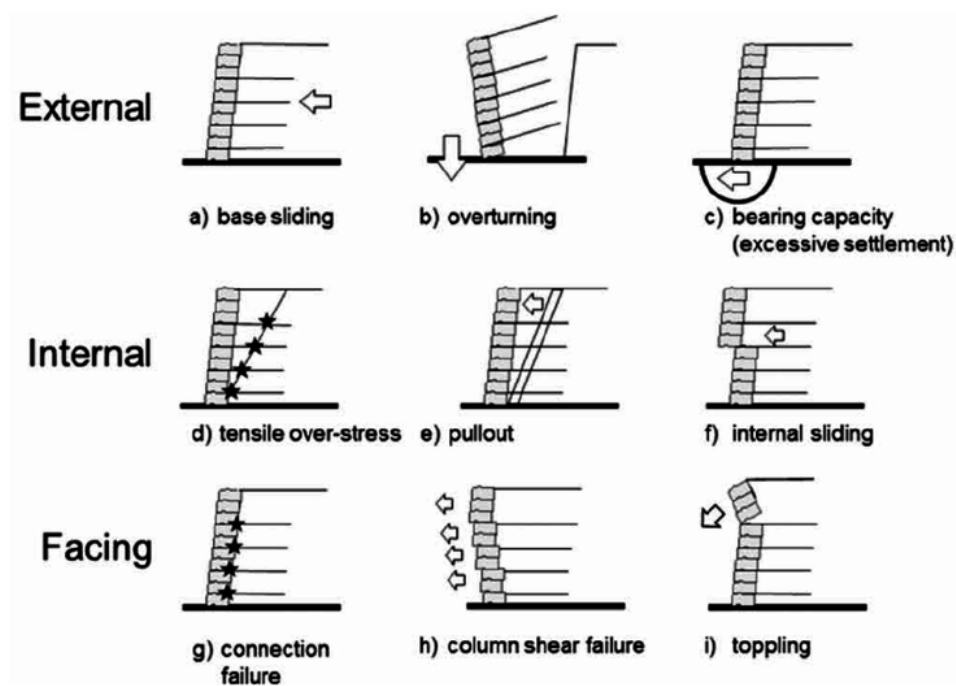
Failure Modes of GRS Walls (Bathurst, 2014).
